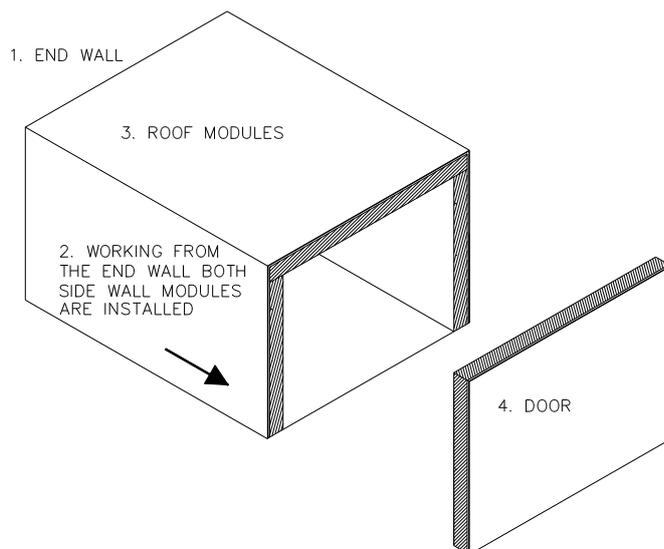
Installation Sequence for a Three Fixed Wall, Roof and Separate Door Application.
